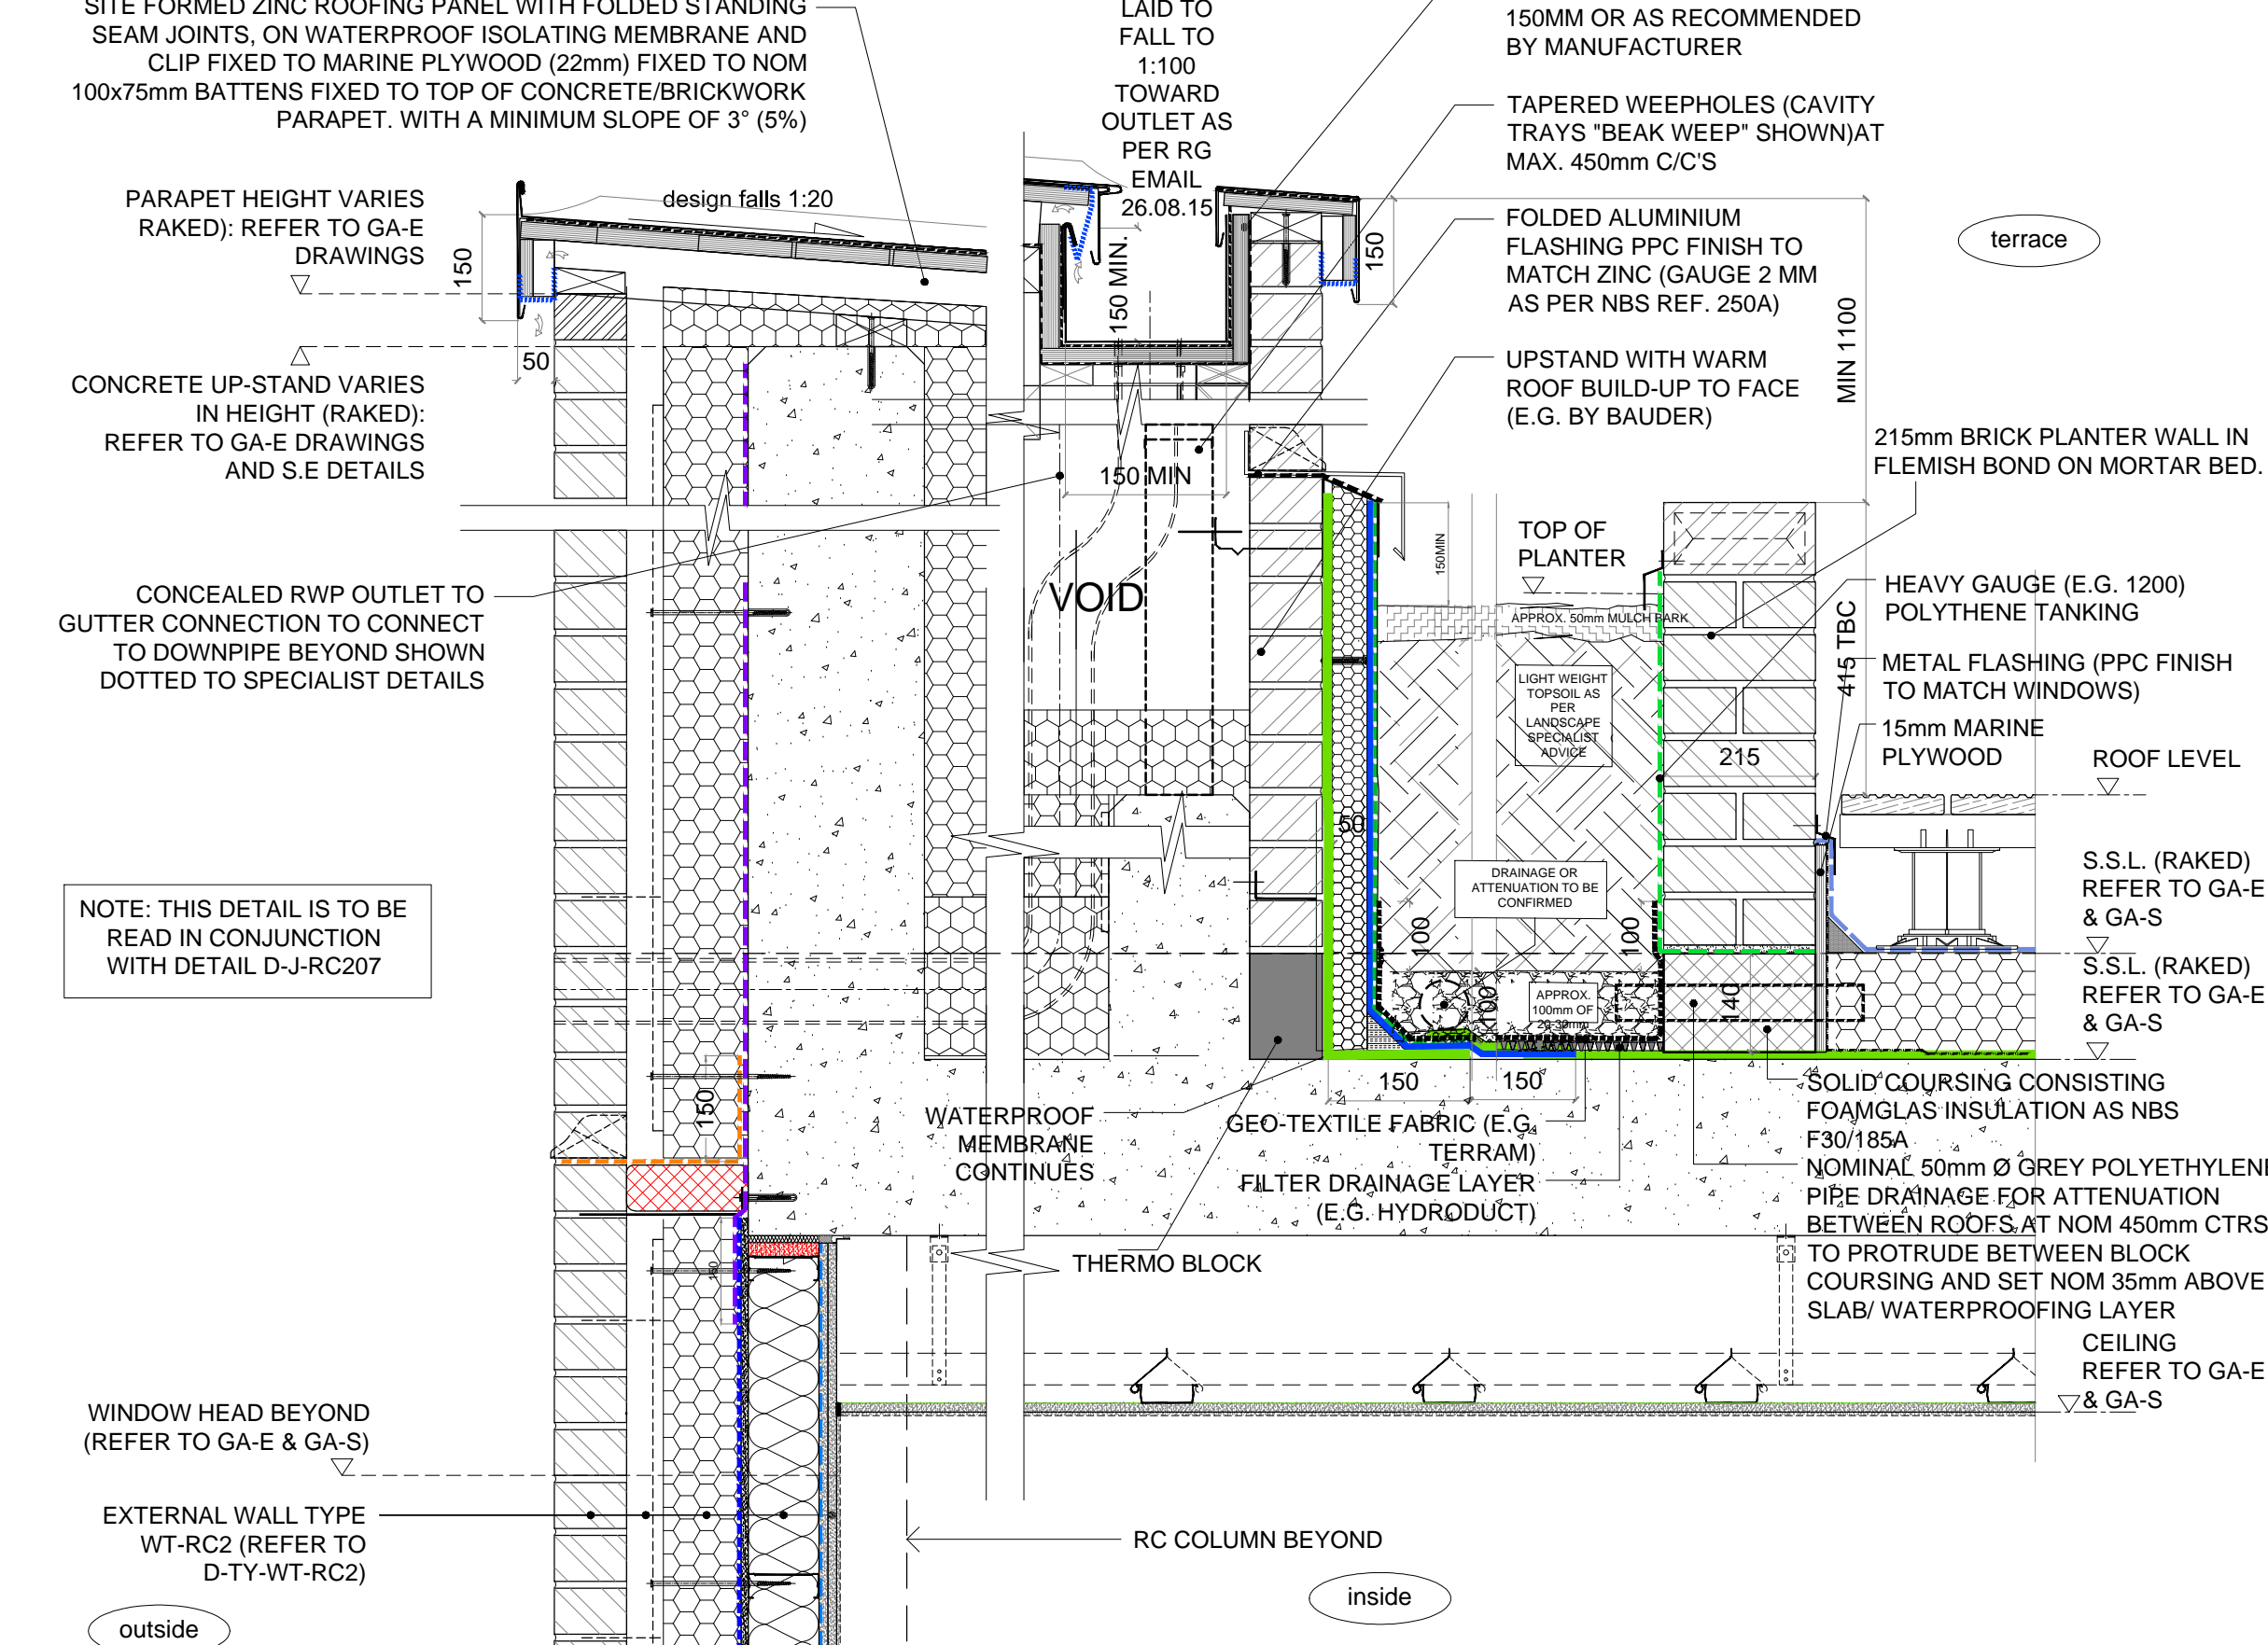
DETAIL - Block C - D-J-RC206 - Wall type WT-RC2 abutment with roof type RT-RC1 (L01 GL CC&05)
